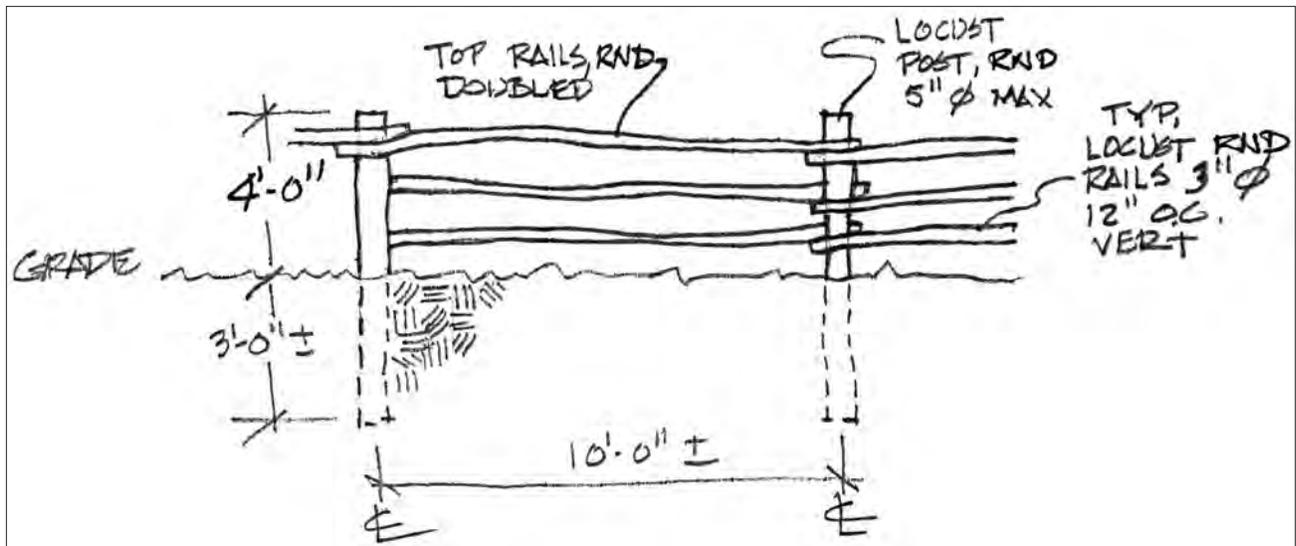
(top). Restored north barnyard sapling fence. Elevation, 2010 (HPTC).
